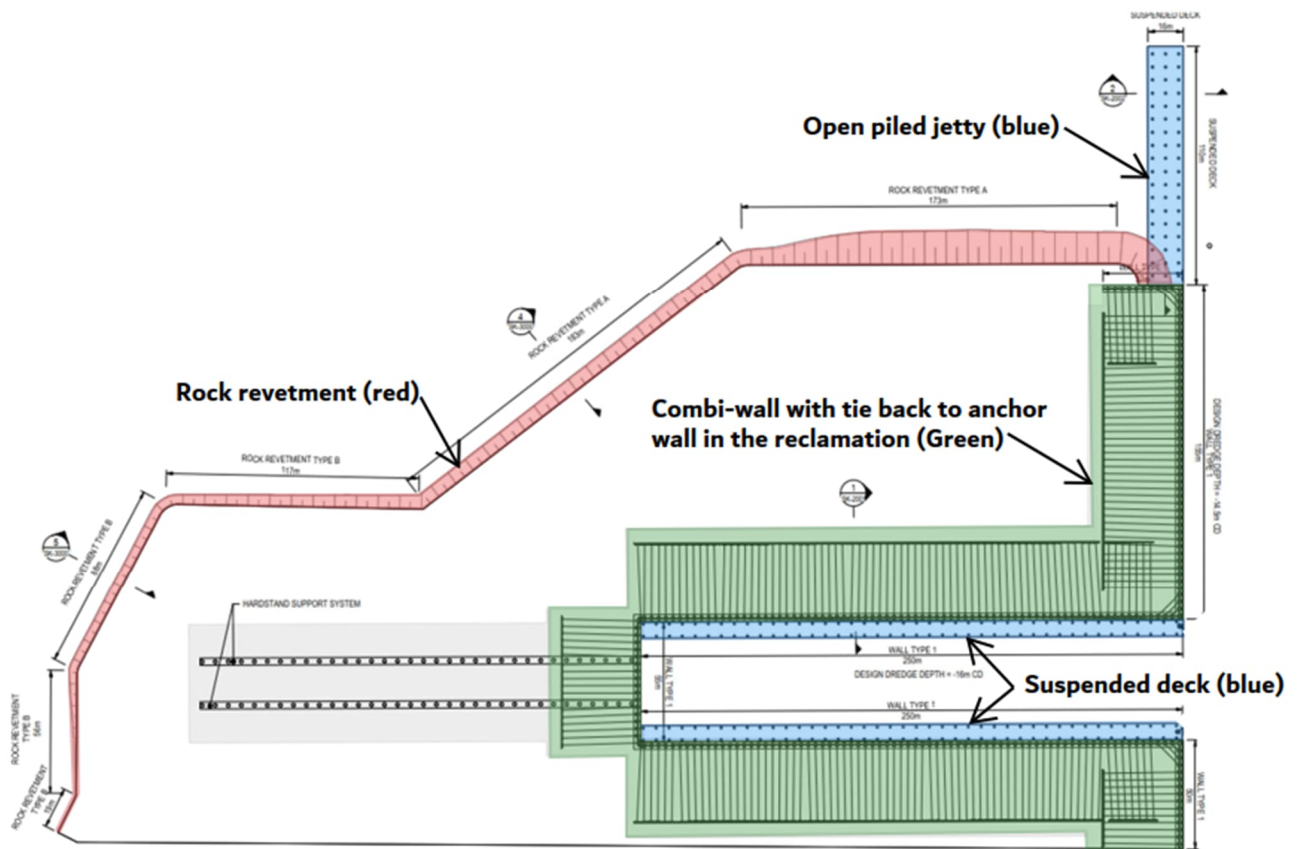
Proposed structures for the Northland Shipyard & Dry Dock facility
